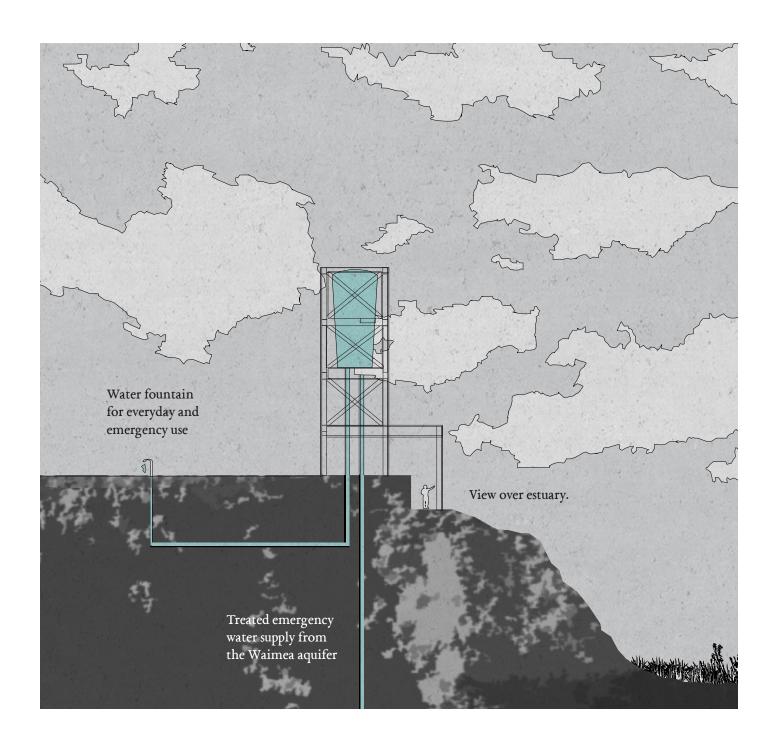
Section BB of Water tower 3 and Dunetop Park
